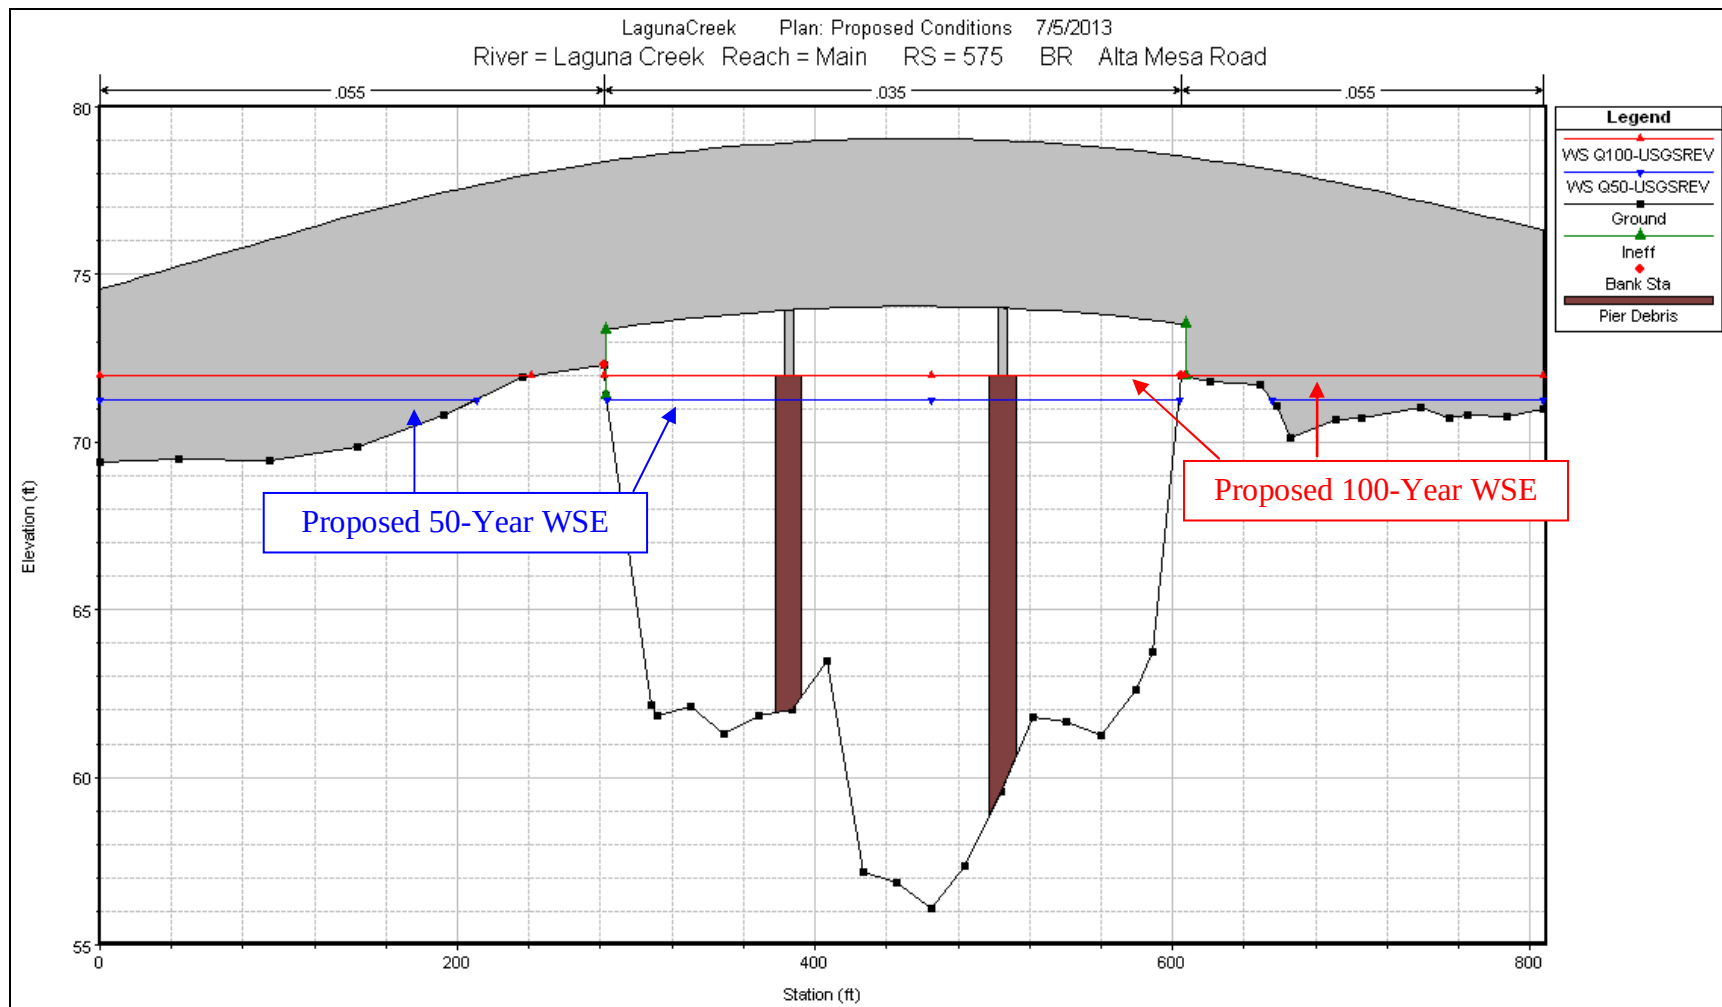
Upstream Face of Proposed Alta Mesa Road Bridge over Laguna Creek
